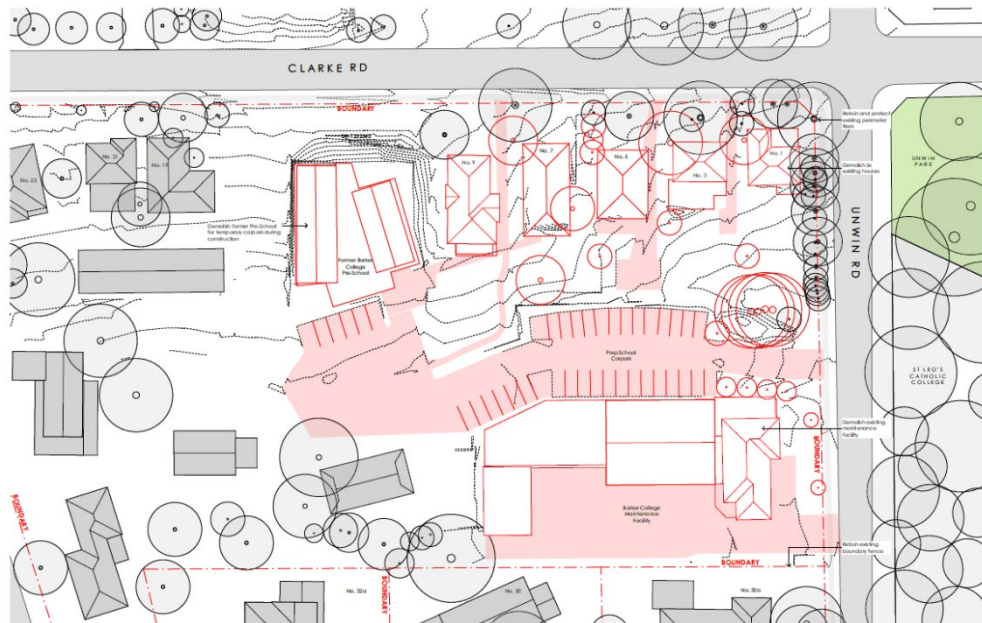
Plan showing the proposed demolition to the south of Clarke Road. (Source: Neeson Murcutt + Neille)
